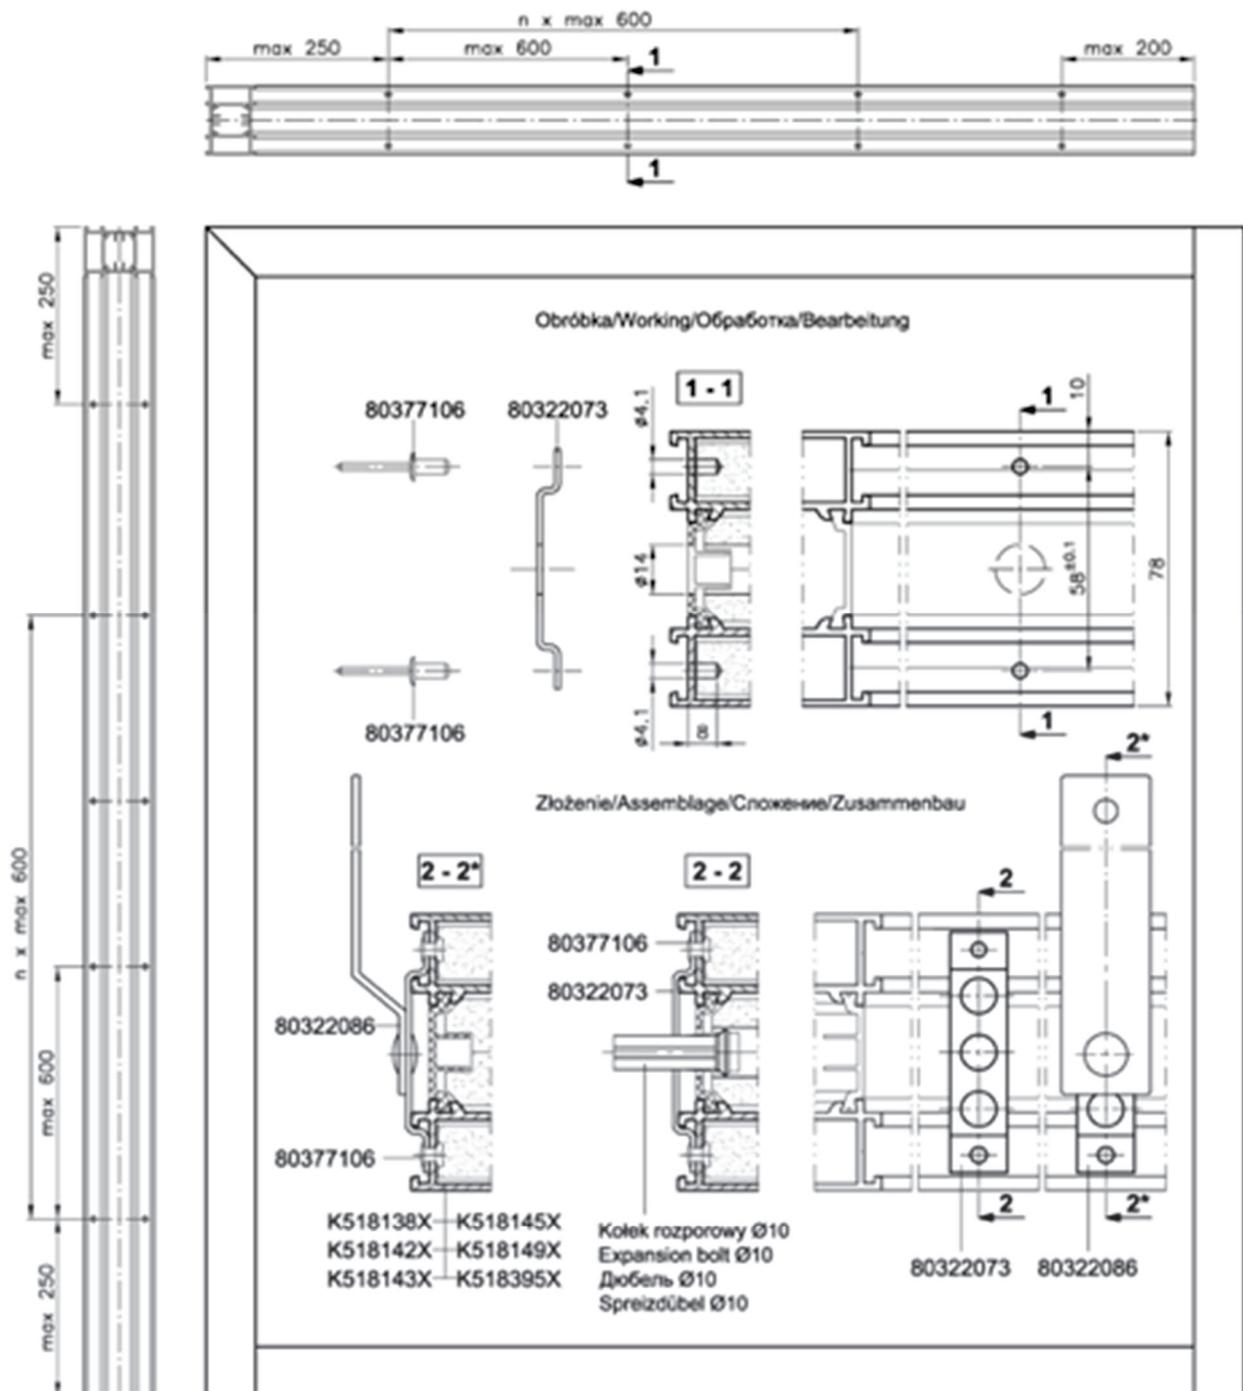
Preparation of frames for fixing to the building structure using concrete screws
